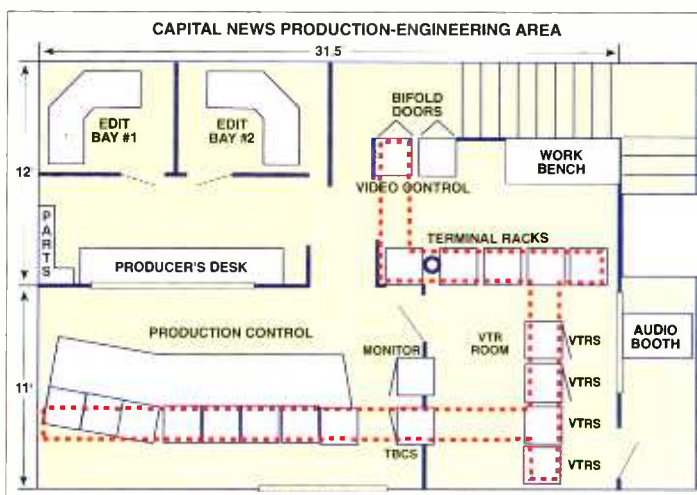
Floor plan of the second floor, showing how much equipment was placed within the limited space. Dotted lines indicate cable trays used to connect the racks.
